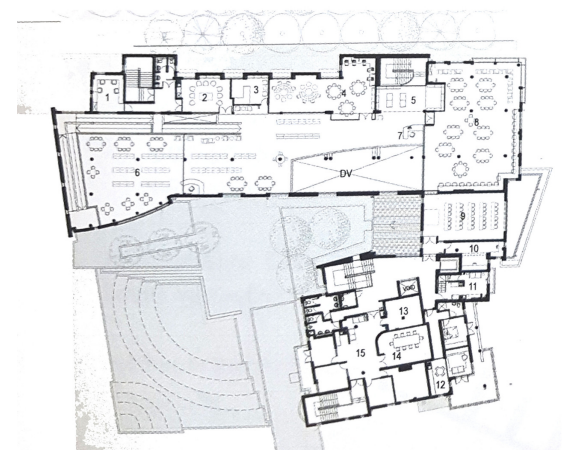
Kuyasa, Second floor plan (www.CCNI.co.za)
